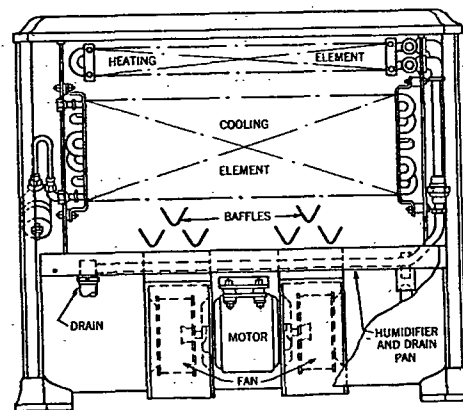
REMOTE FLOOR TYPE ROOM UNIT AIR CONDITIONER
